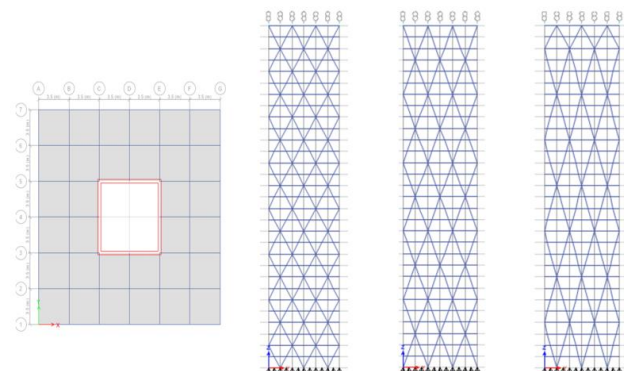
Plan & Elevation of 30 Storey Diagrid Structural System with 4Storey, 6Storey & 8Storey Module variation
